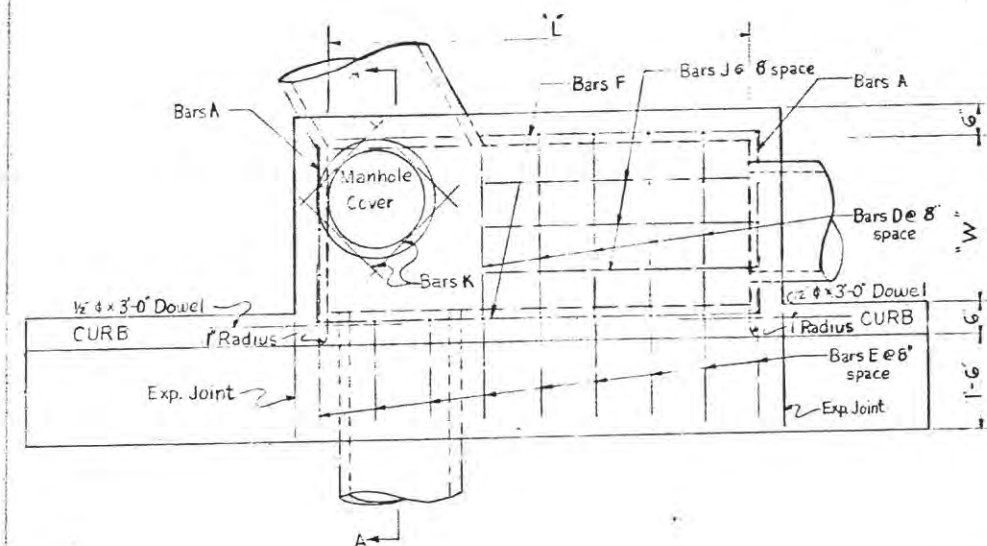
### DETAILS - STORM SEWER MANHOLE TYPE 'B'
